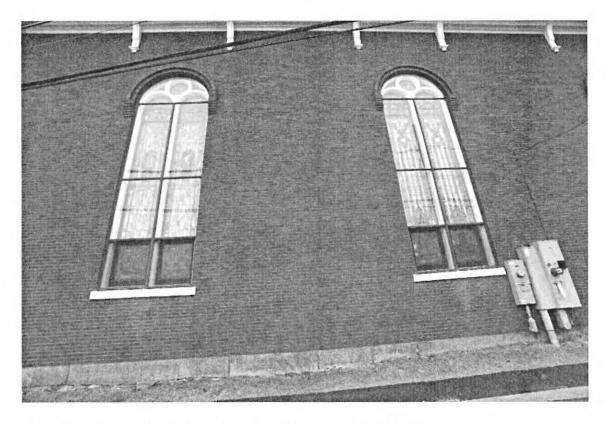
North Elevation Window Details, 1861 Portion, January 2020
